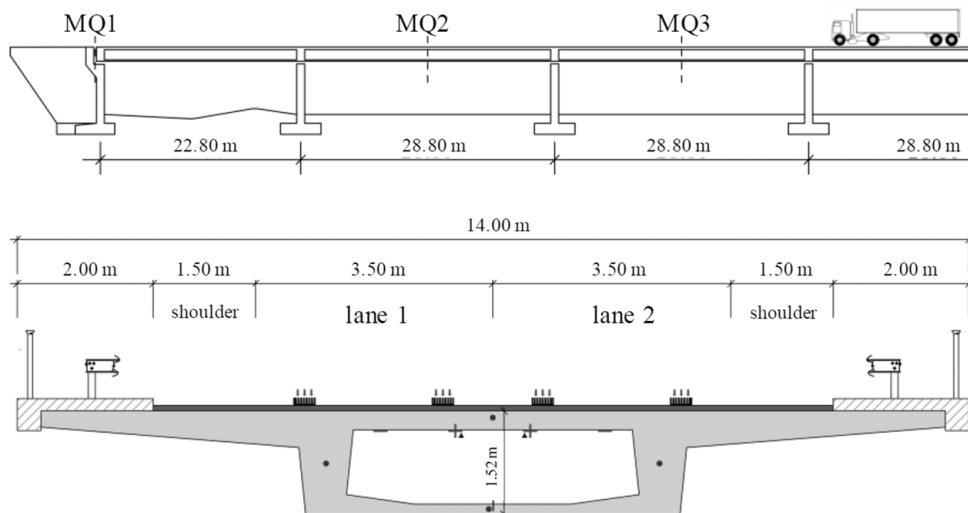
Bridge structure longitudinal section (above), cross section (below) [32].
